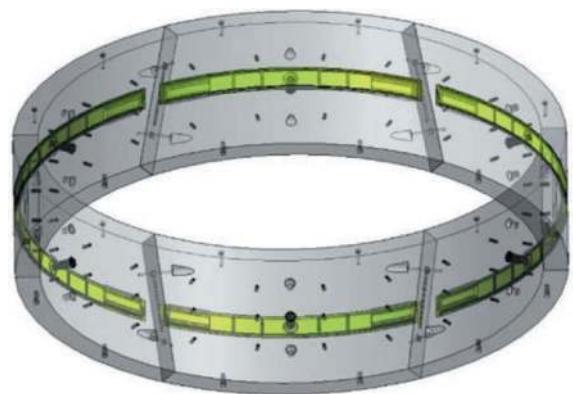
3D view of segmental tunnel lining equipped with inflatable O-ring sealing system.
